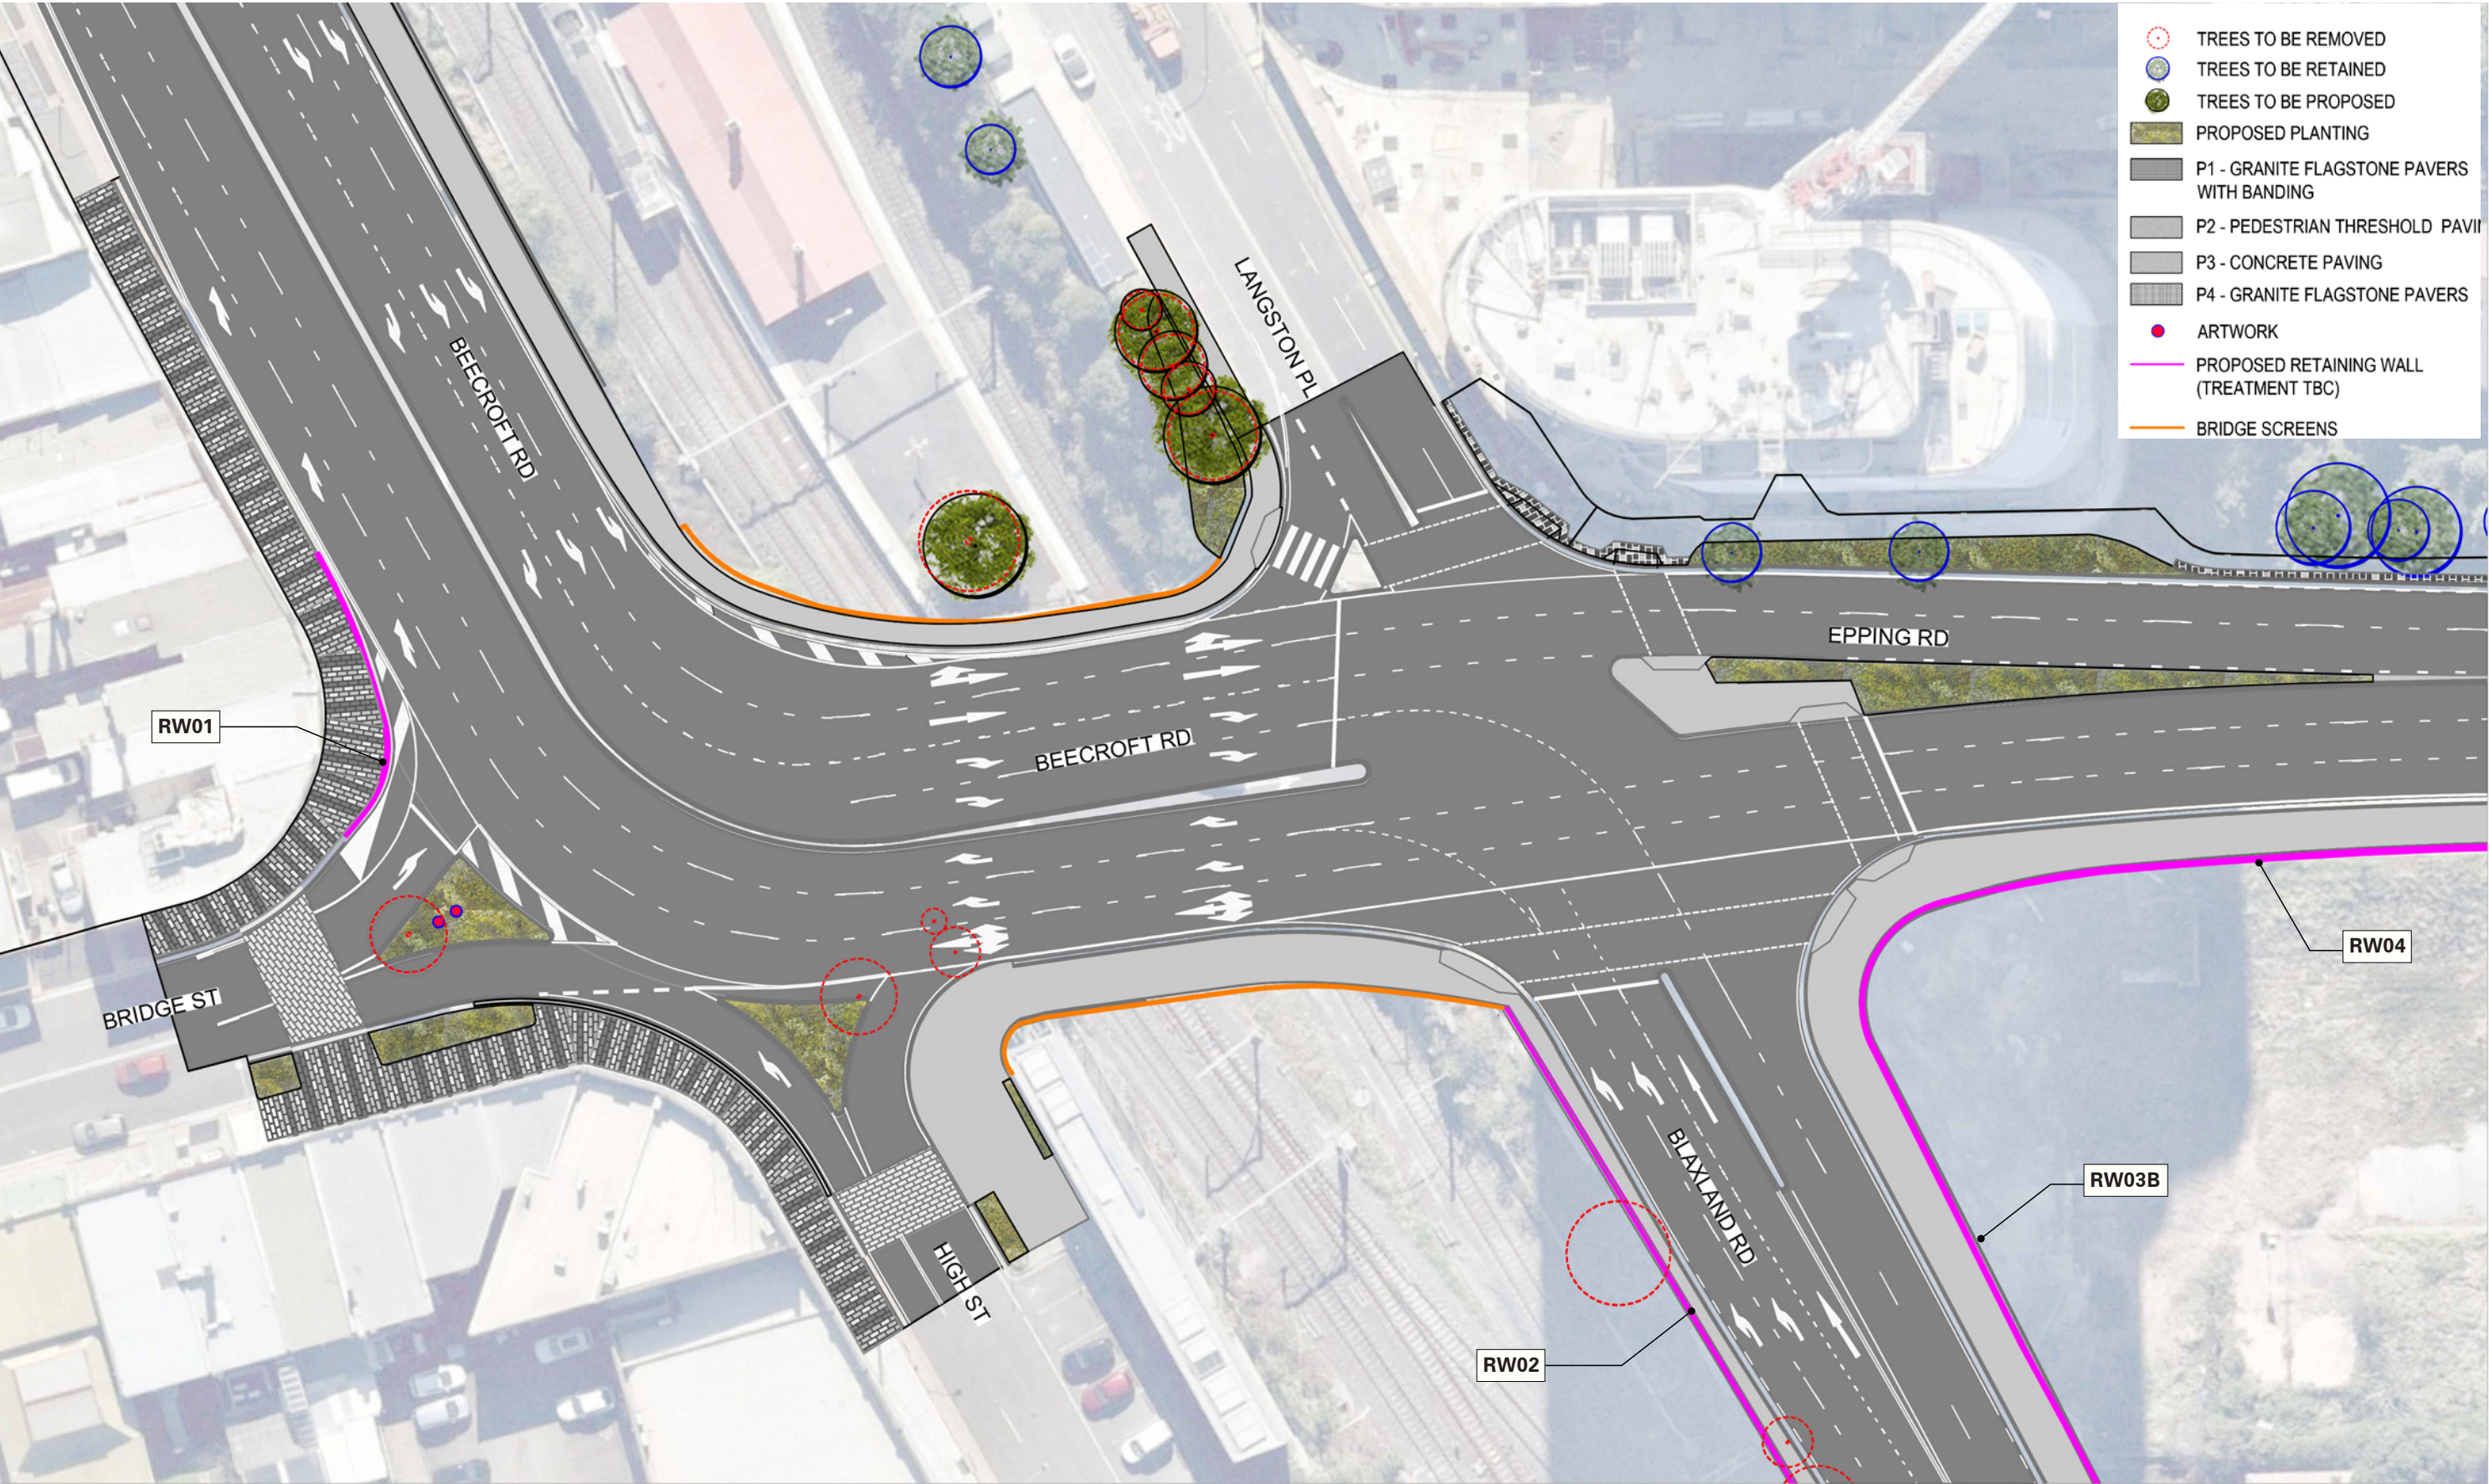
Epping Bridge, detailed landscape plan, subject to detailed design development
